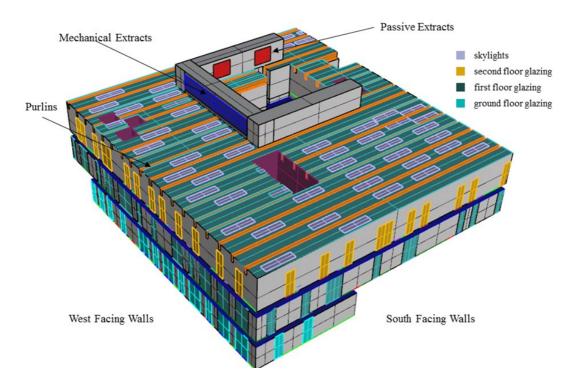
One quadrant of the open plan office design viewed from the south and west facades. The top left and right boundaries connect to other parts of the office. (see also Figure 4).
